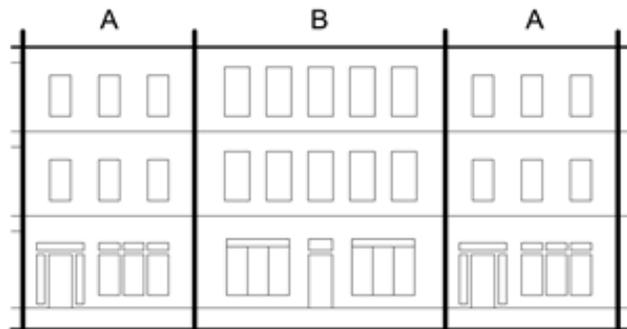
Different Vertical Façade Bay Compositions within a Block Face- “A” and “B” have: different number of bays; different Ground Story window and door configurations; and different Upper Story window sizes and spacing.
